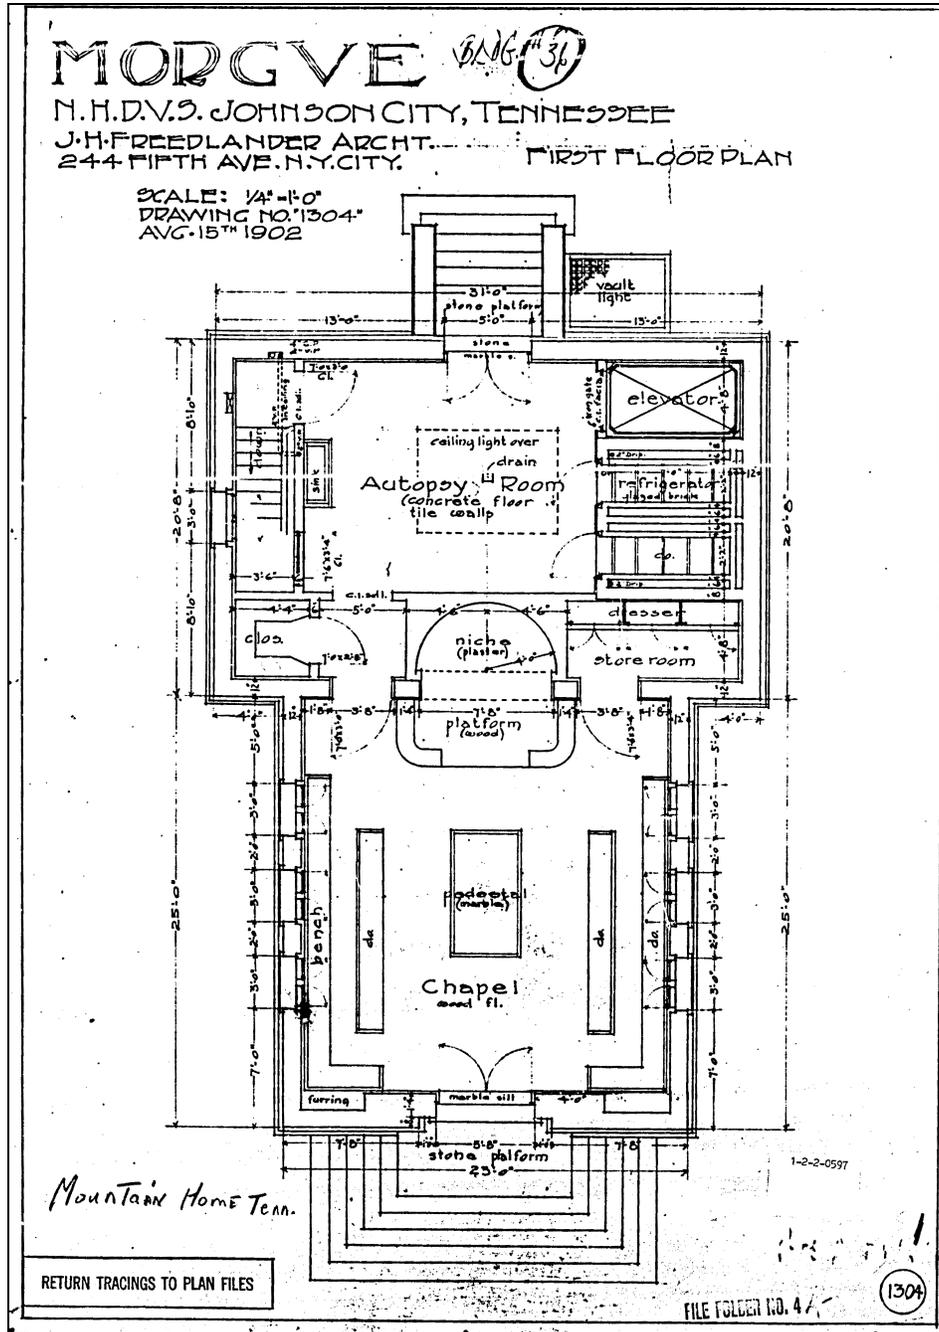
Mountain Branch Morgue First Floor Plan, (15 August 1902).
